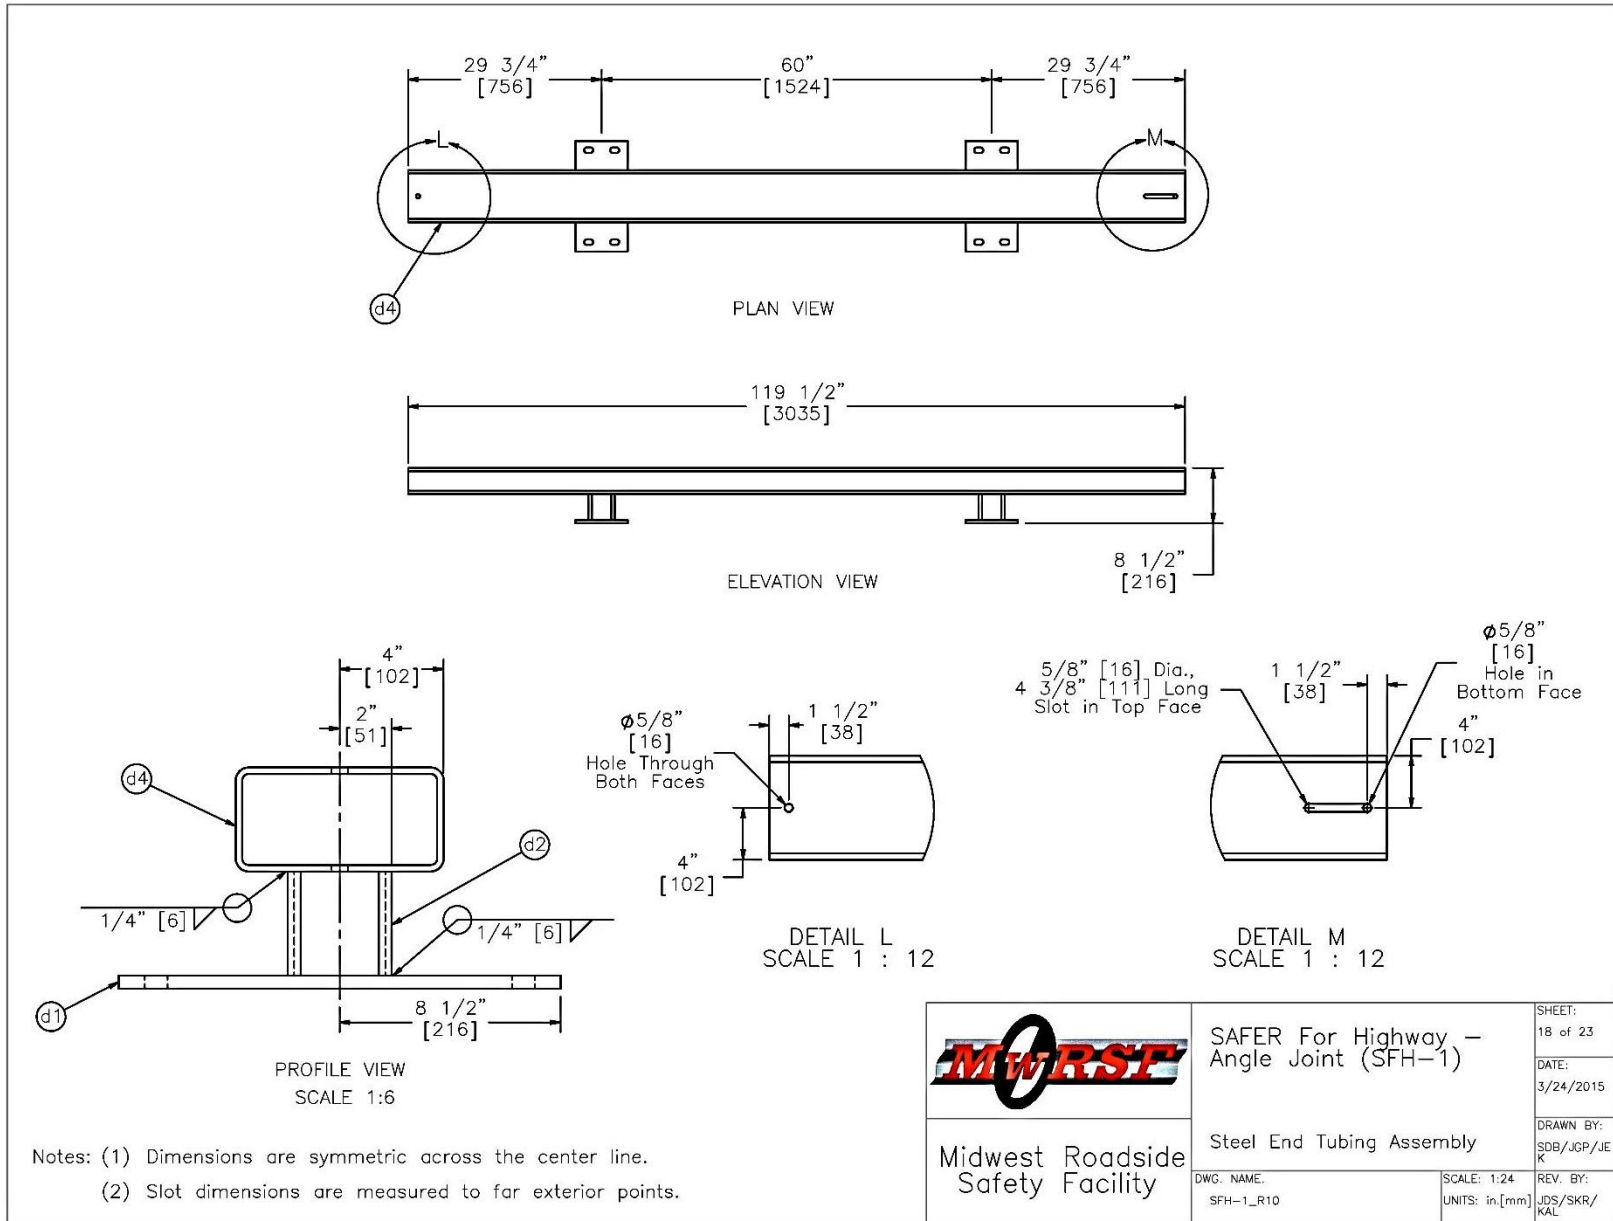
Steel End Tubing Assembly, Test Nos. SFH-1 and SFH-2
